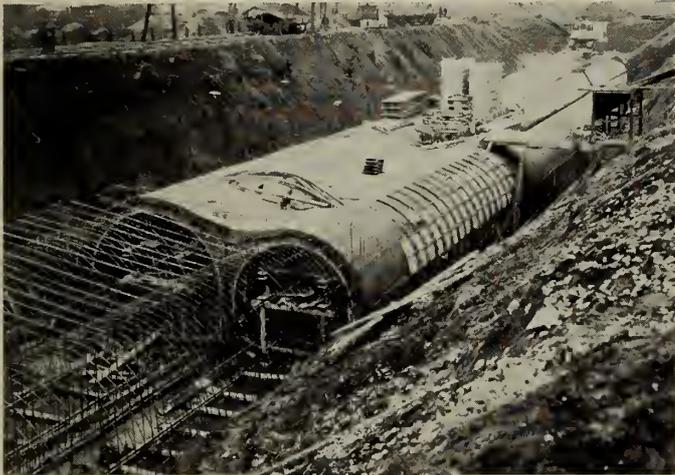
St. Pierre River Collector, Montreal. Inside dimensions of Twin Section 14 ft. by 14 ft. 6 in. and 16 ft. by 17 ft. 6 in.
